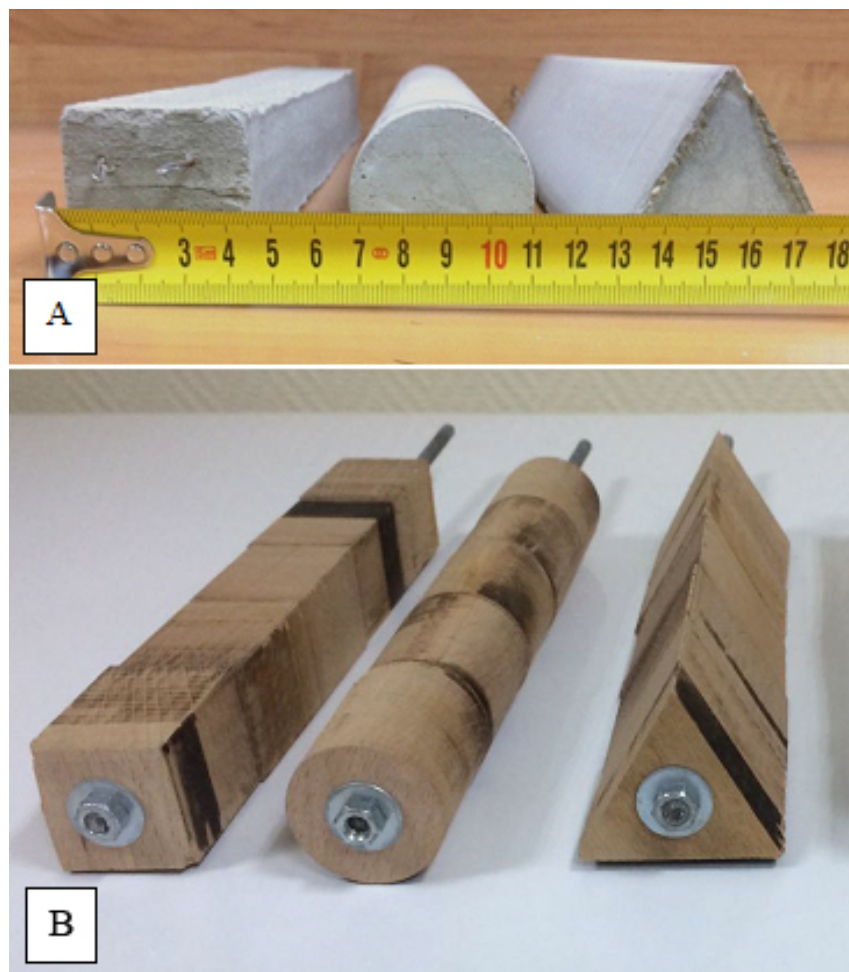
Pile models made of concrete (A) and pile models made of wood (B).
